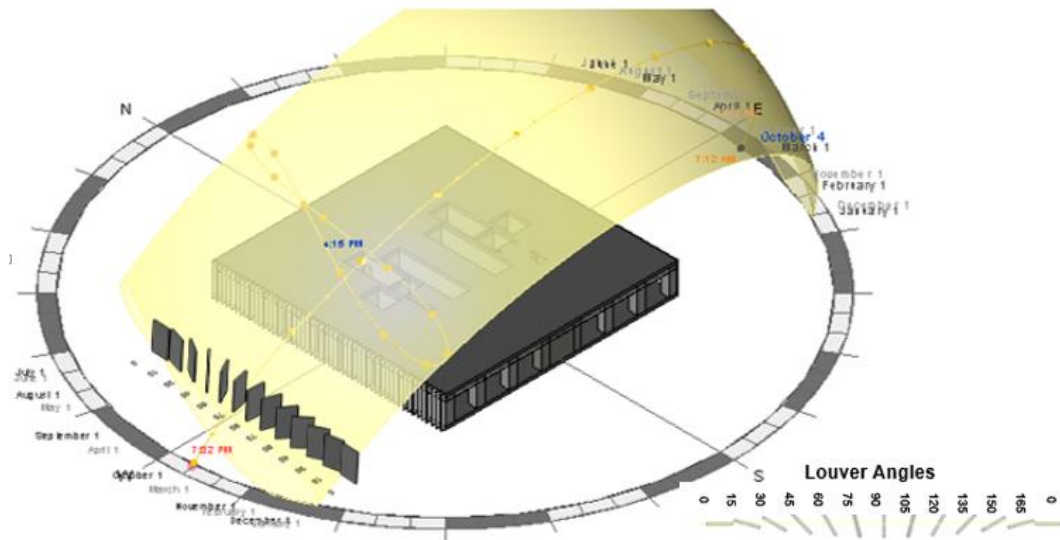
3D views detailed the West elevation louver configurations with the sun path (Revit Software).
